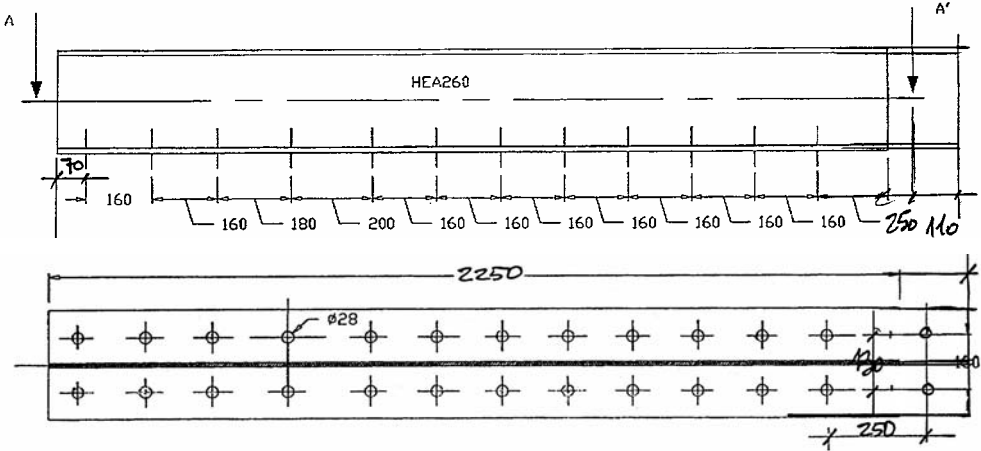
K-bracing and shear-link: detail of Pos. 15
